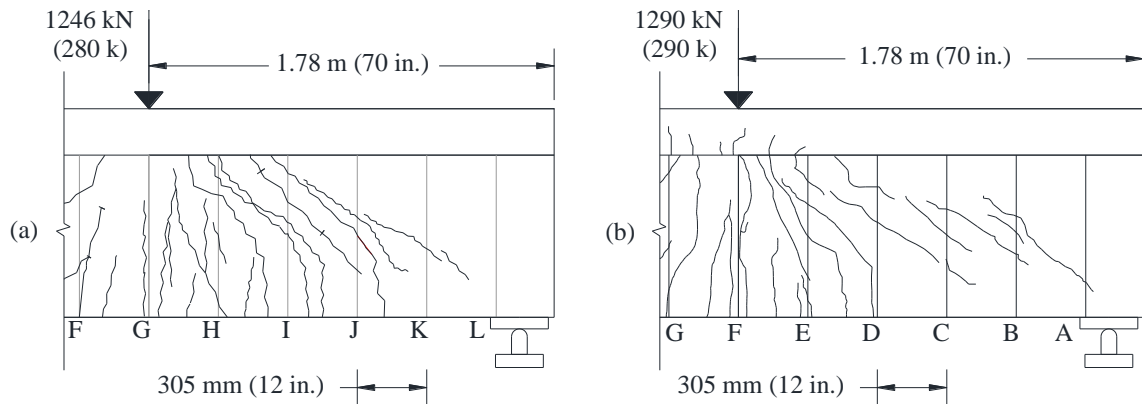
Crack Patterns under Shear Tests: (a) AFRP Specimen and (b) Control Specimen.
